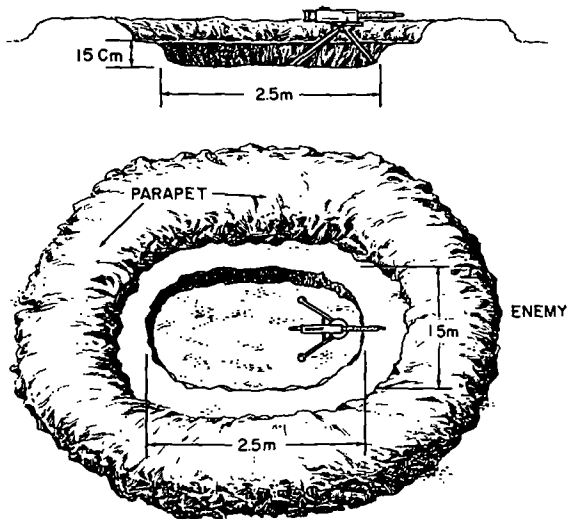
Plain view and cross-section of pit type emplacement for caliber .30 machinegun.
